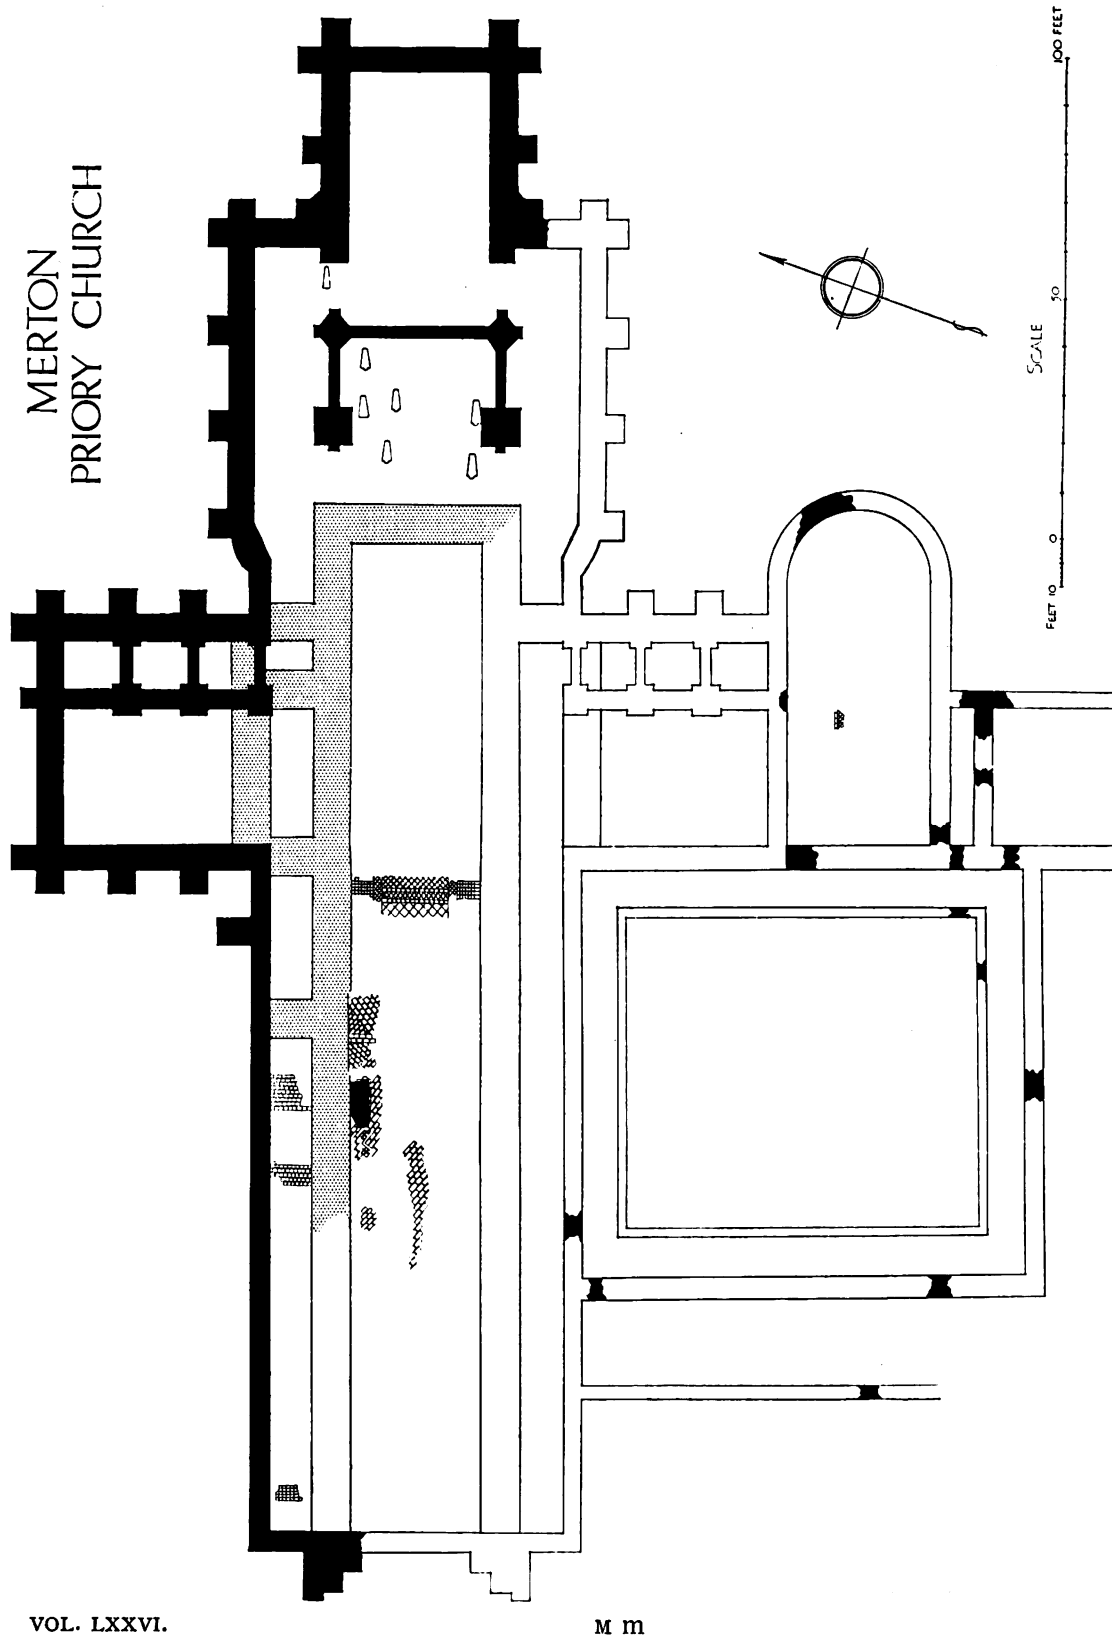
Merton Priory church : ground plan. Foundations proved by excavation : floor level, black ; below floor level, stipple. Conjectural walls in outline.
